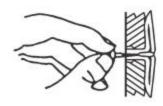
Popping Open Anchor Wing For Thin Walls
